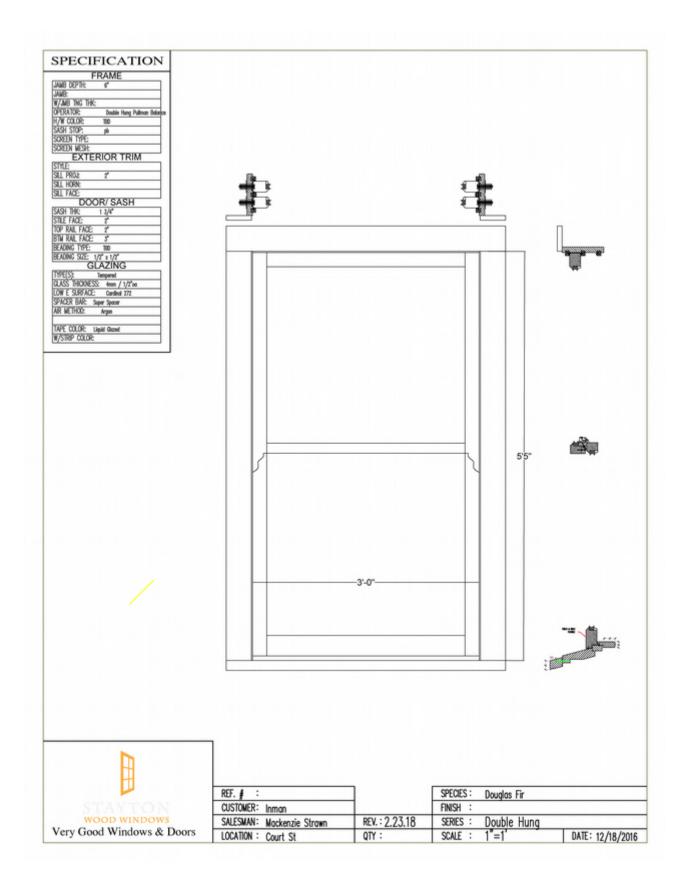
Back Bedroom Window - Stayton Windows Shop Drawing
